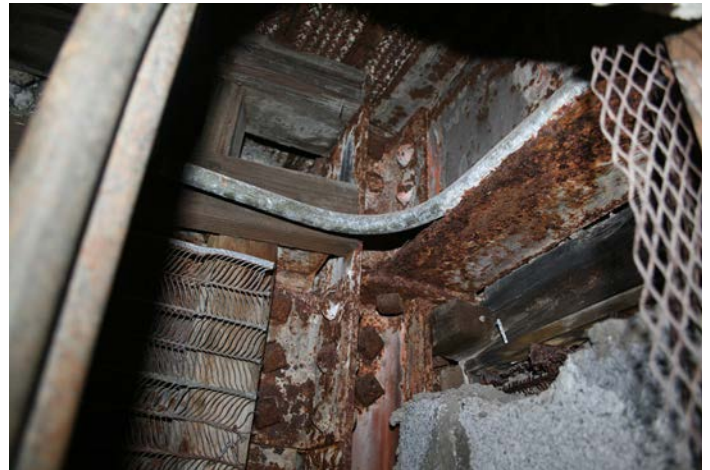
D-54 Top of westernmost interior column and beam framing into the column. Note minor corrosion of steel.
